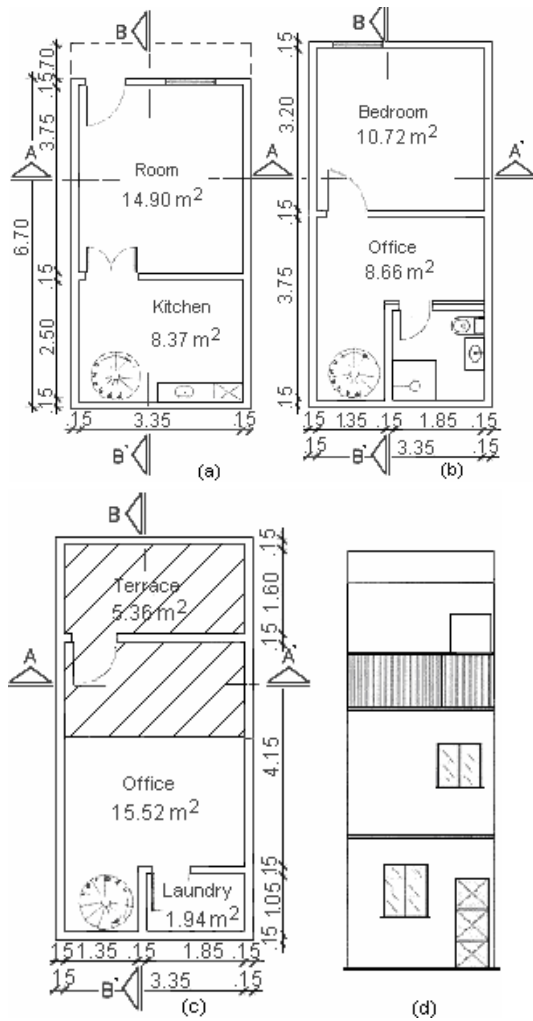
Plans of the first-floor (a), the second-floor (b), the third-floor (c) and the facade (d).
